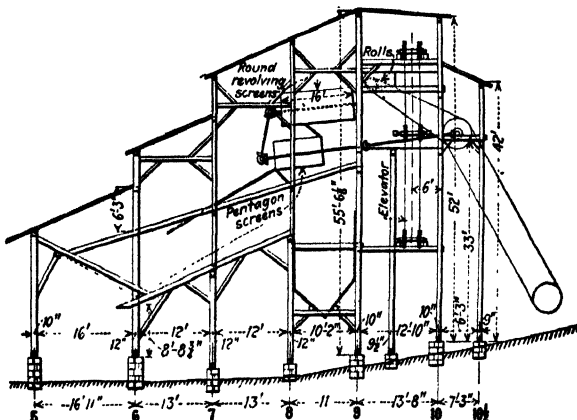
SECTION OF OLD FORGE BREAKER OF PENNSYLVANIA COAL CO., BUILT PRIOR TO 1884. ELEVATOR WAS INSTALLED THAT YEAR.
